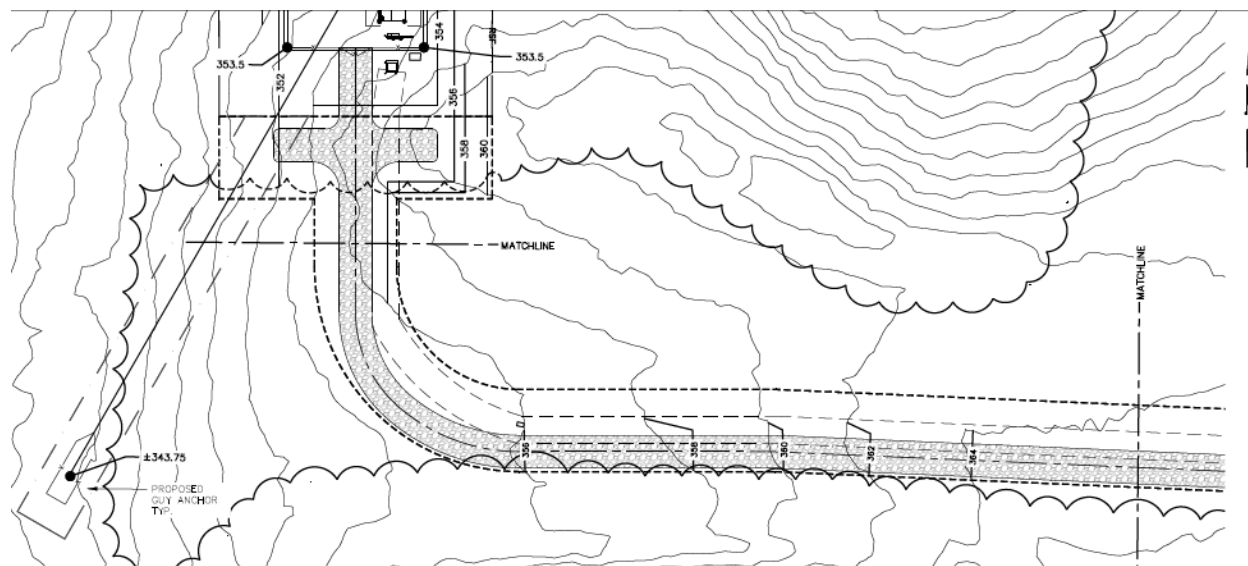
Site Plan with Stormwater and Sediment Controls continued
